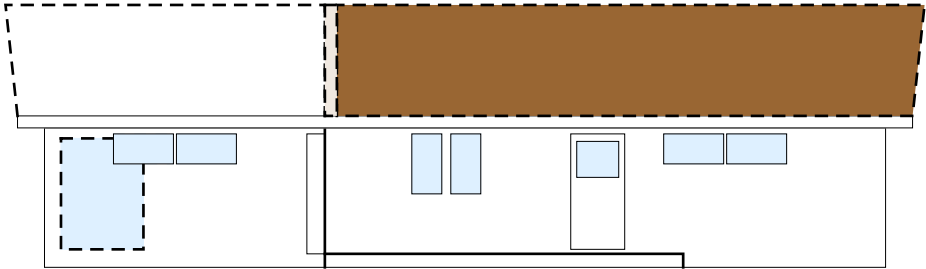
Elevation view existing of the house with addition, viewed from the south. New roof is outlined with dotted lines surrounding white space. Three new addition windows are shown. The existing double door that will open into the addition is shown with dotted outline, showing only the part not directly in back of the new windows. Locations of windows on the addition may change based on information obtained in the building permit application process.
